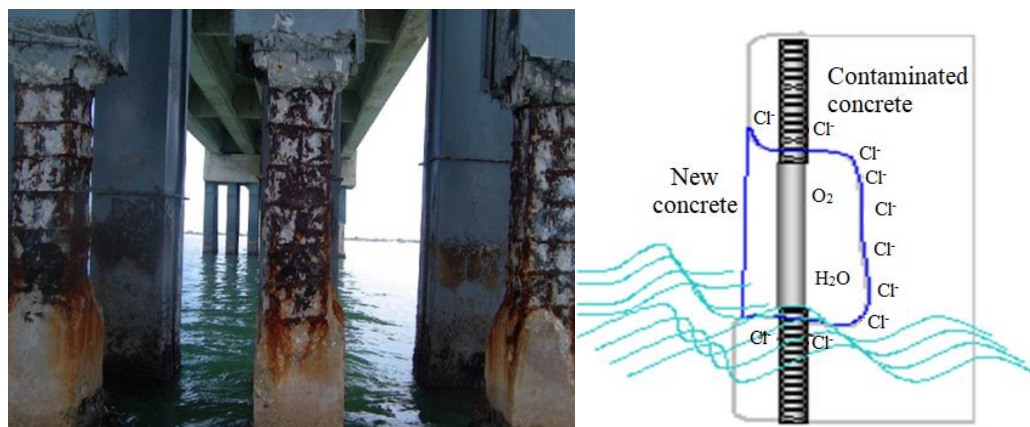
Repairing concrete structures using stainless steel proposed by Pérez Quiroz, (2009)
